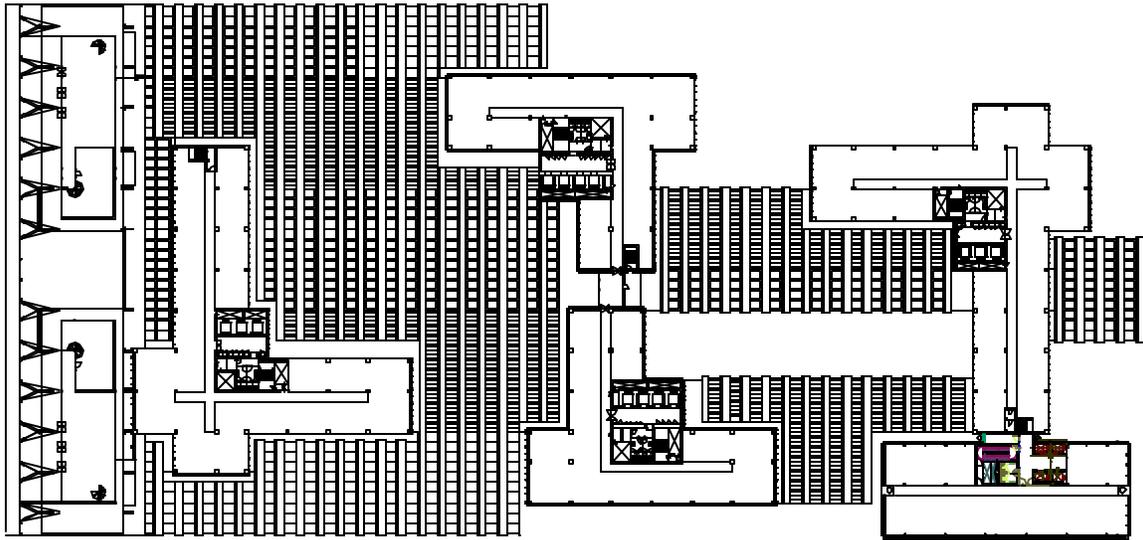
Seventh Floor Plan of WTC, not to scale (courtesy of KPFI)
